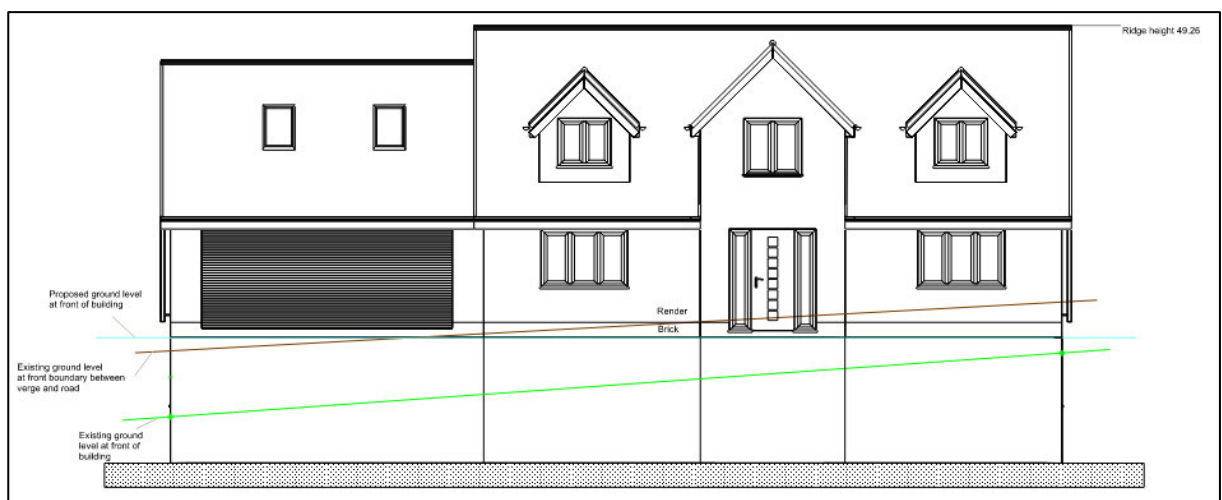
Approved front elevation at Elmbank, Crays Hill (22/01624/FULL)
